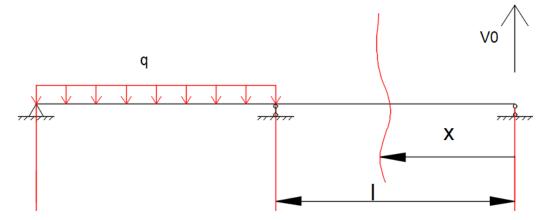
Static scheme for the case of a two-span beam with a distributed load of 1 beam span for second span.
